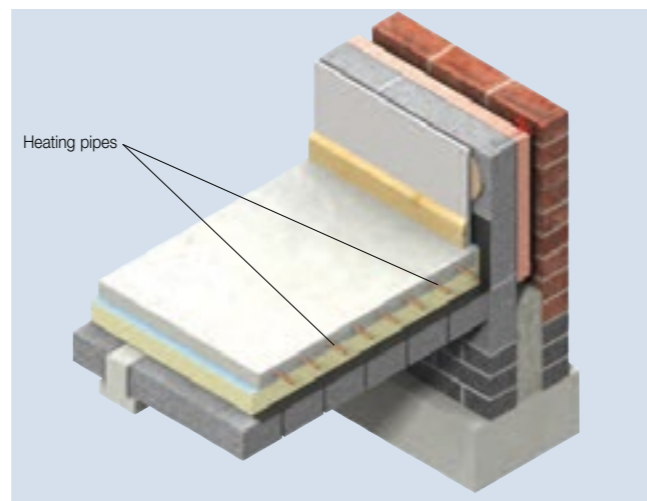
Intermittent Heating Applications – Beam and Block Floor
